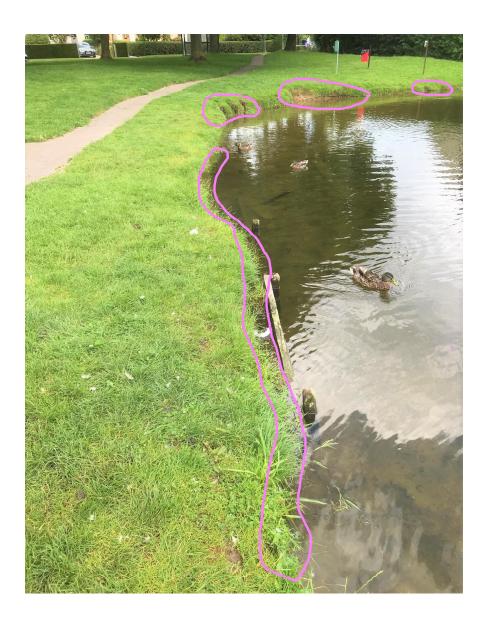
Stretch of river bank at Caley Green (looking South-West) showing areas of eroded bank (and extent of existing but decaying wooden revetment)
